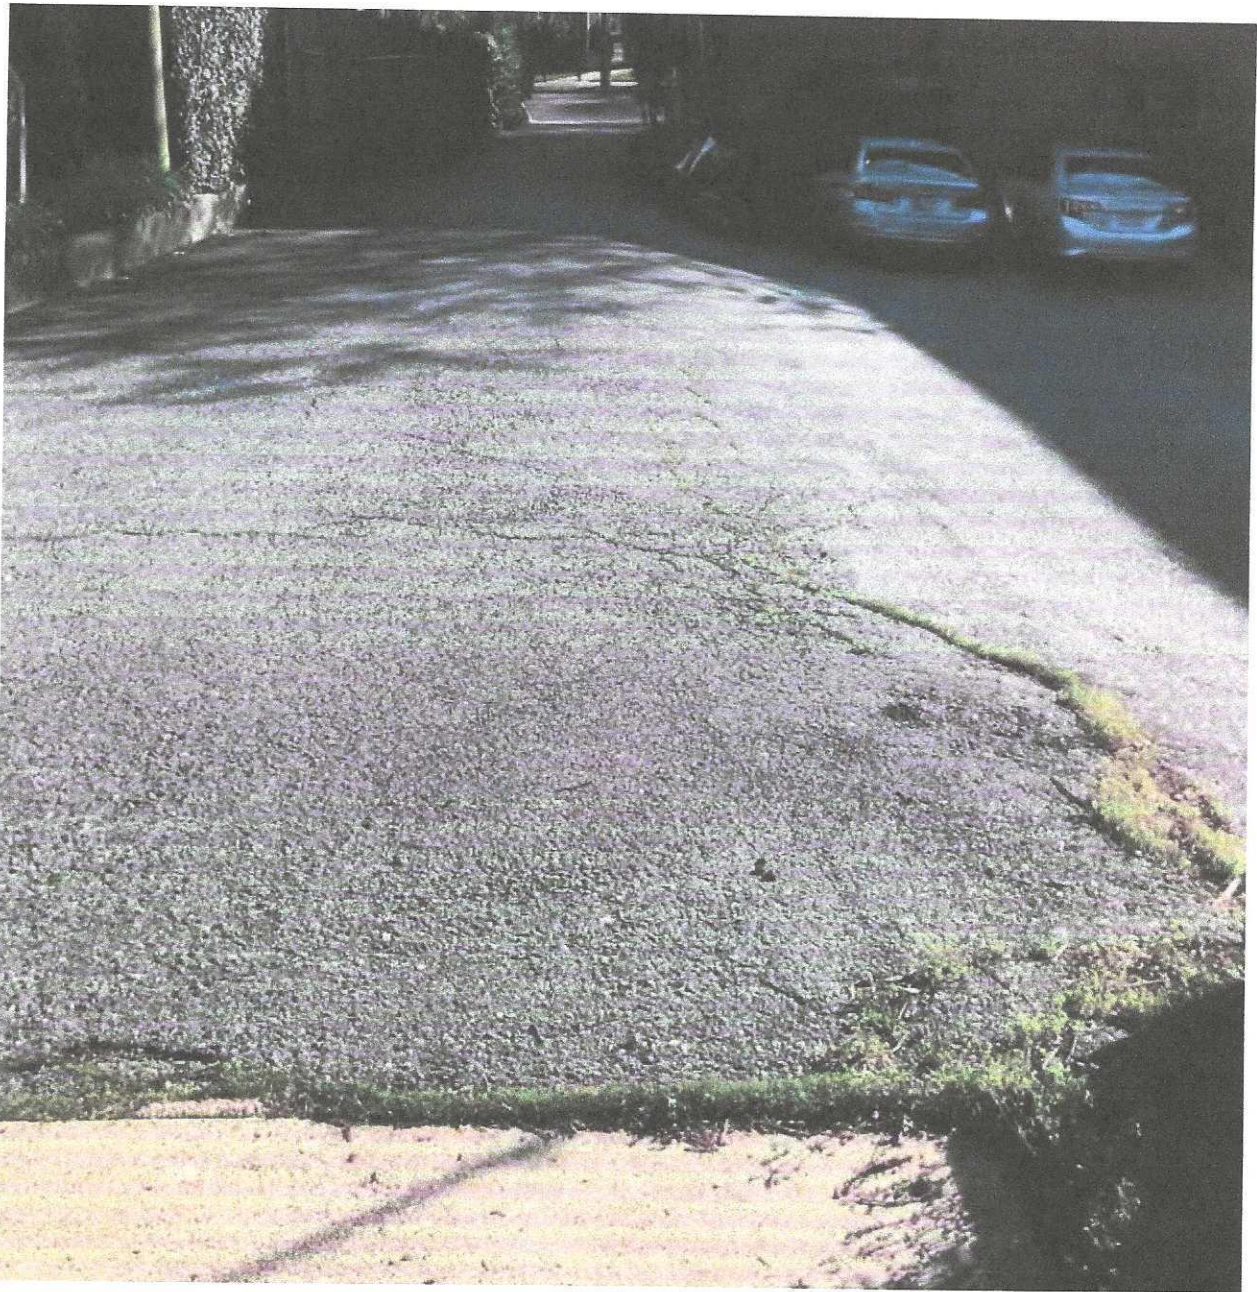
Private parking lot of 4465 MacArthur used as a turn around, note cement driveway of 4461 at bottom of photograph
